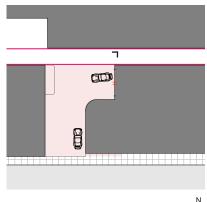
Private Void 2; 1:1,200 Existing, plan
